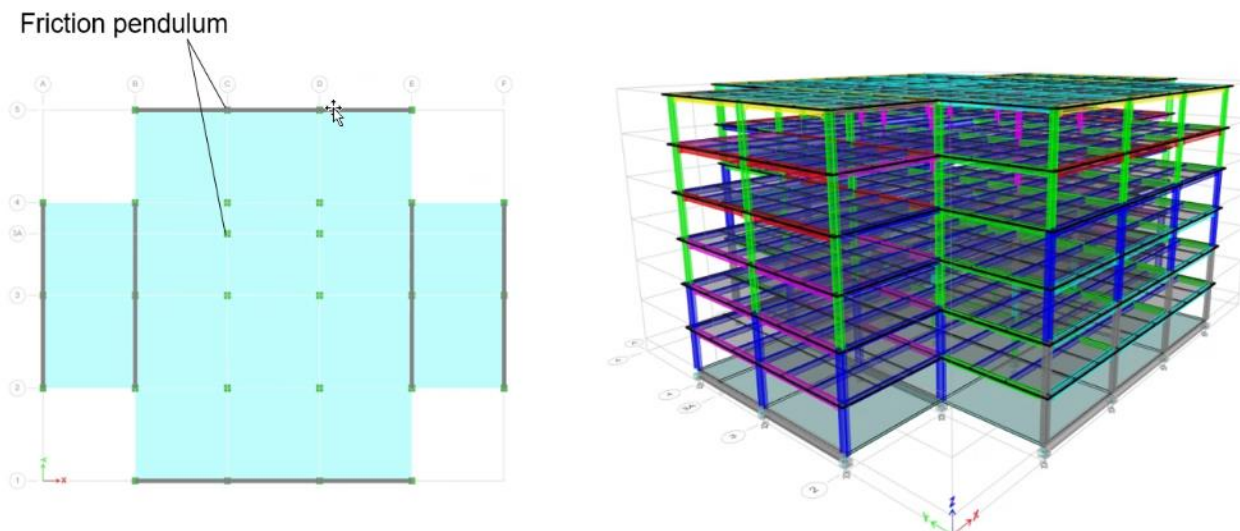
Floor Plan at the Isolation Level with Isolators Layout and 3D View of the Base-Isolated Building - Undeformed Configuration.
